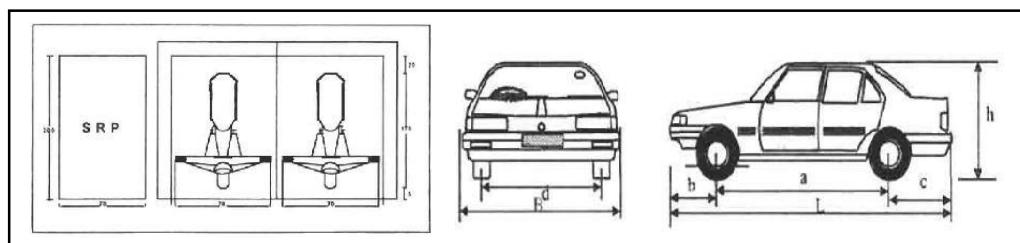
Standard Vehicle Dimensions of Motorcycle and Passenger Cars
